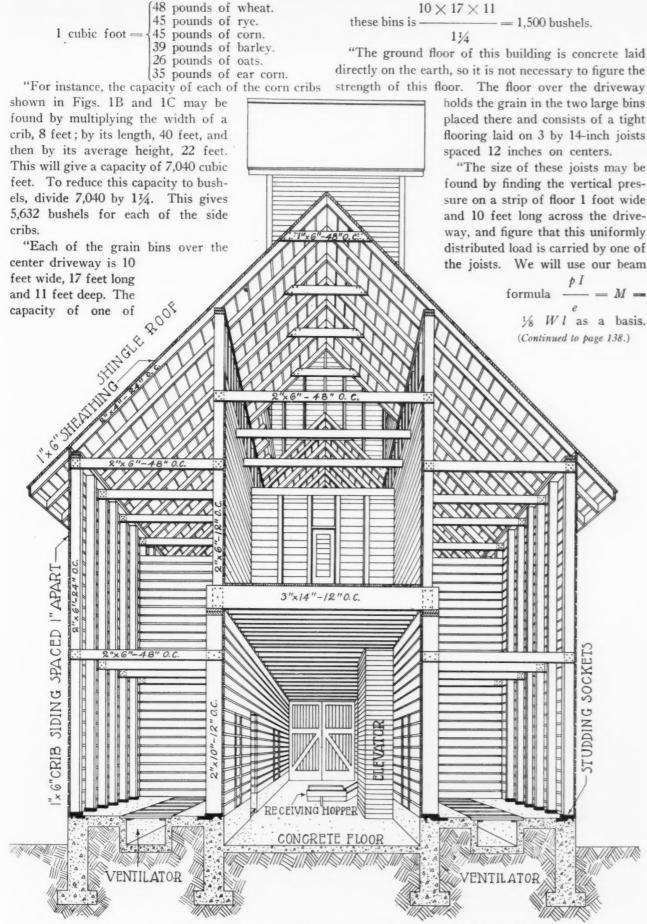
C. Section and Interior Prospective of Grain Storage Building, Showing Details of Framing.
